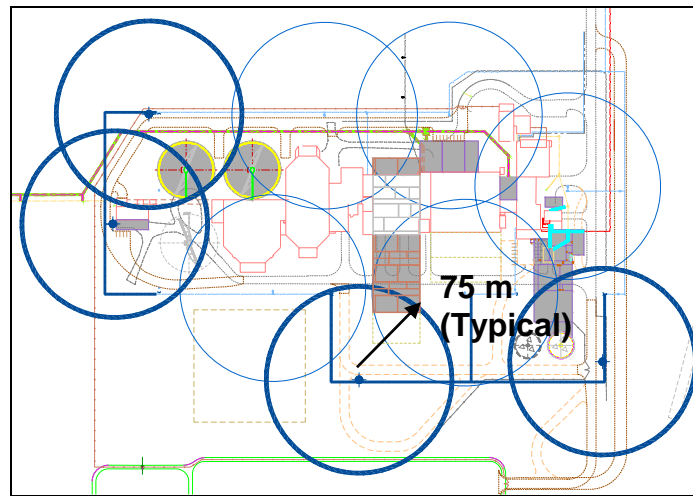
Existing and Proposed Fire Hydrant Spacing
